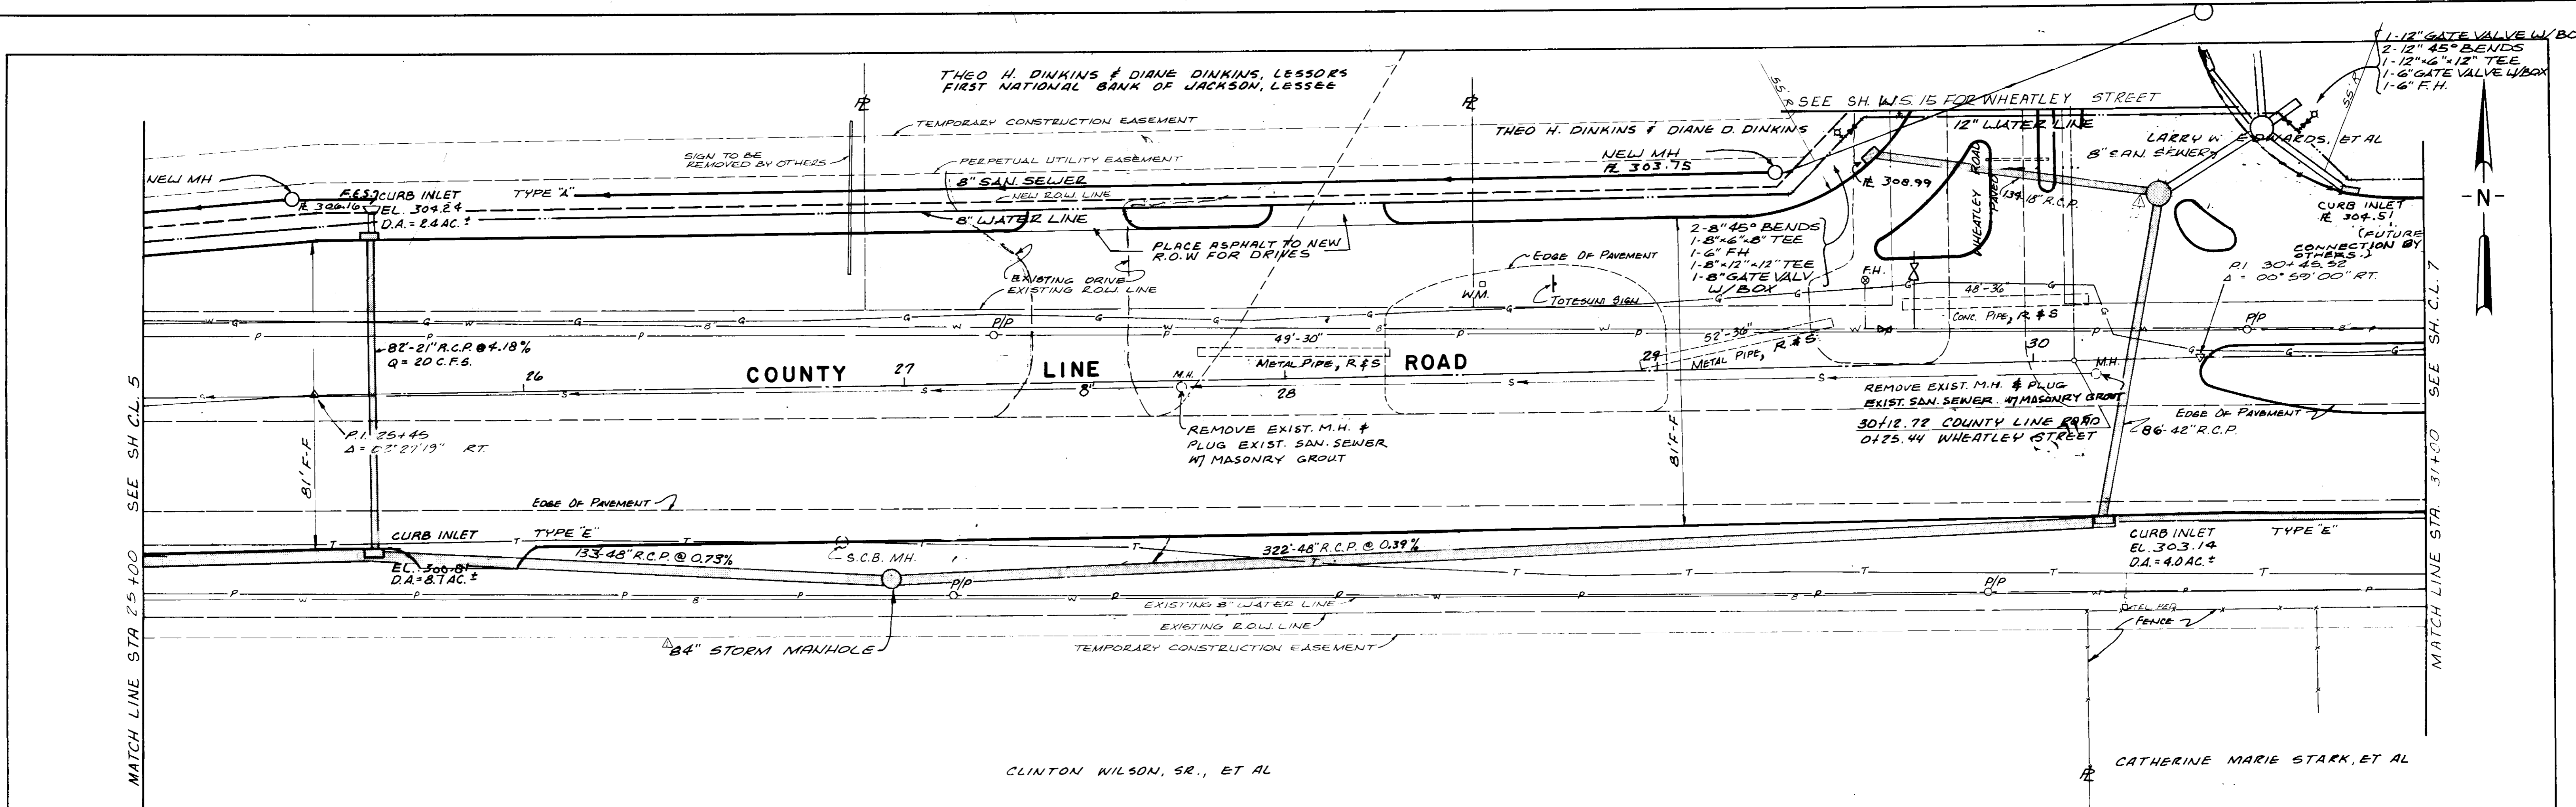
SINGLE PLAN AND PROFILE-FULL DOT
